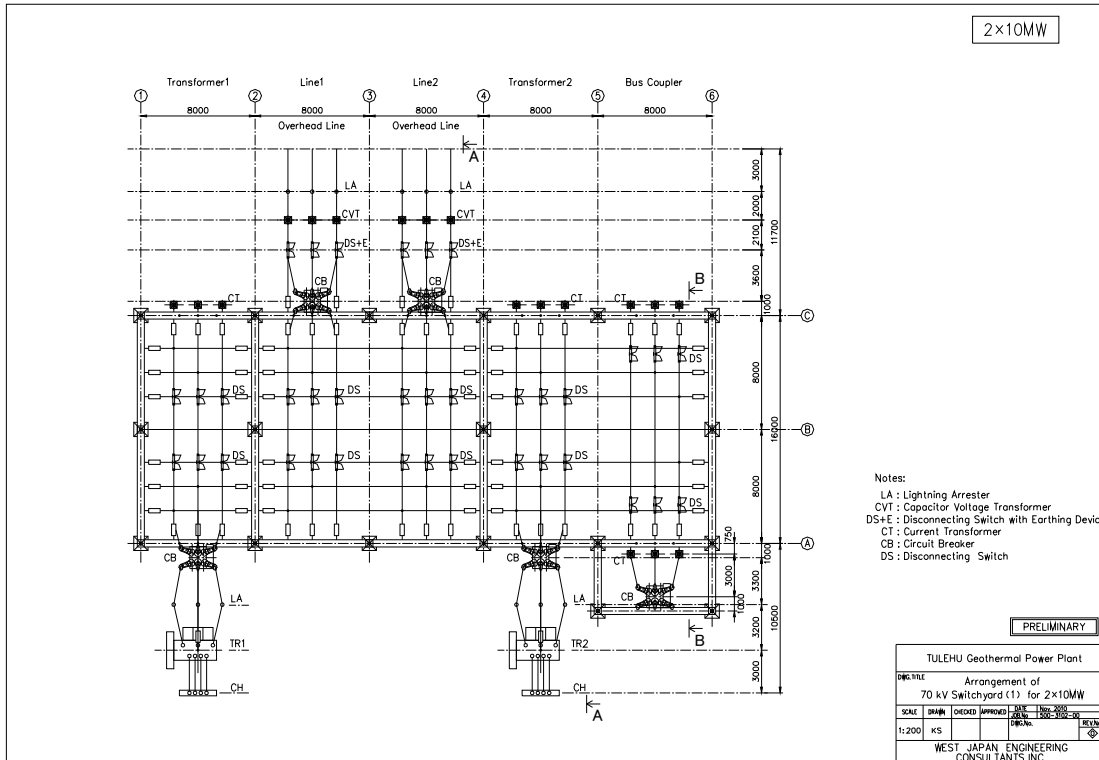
Plan View of 70 kV Switchyard for 2 x 10 MW
